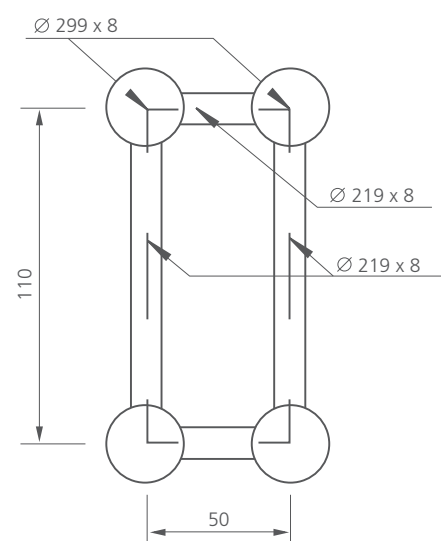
Cross-section of Steel Tube Truss Beam (Unit = mm)
